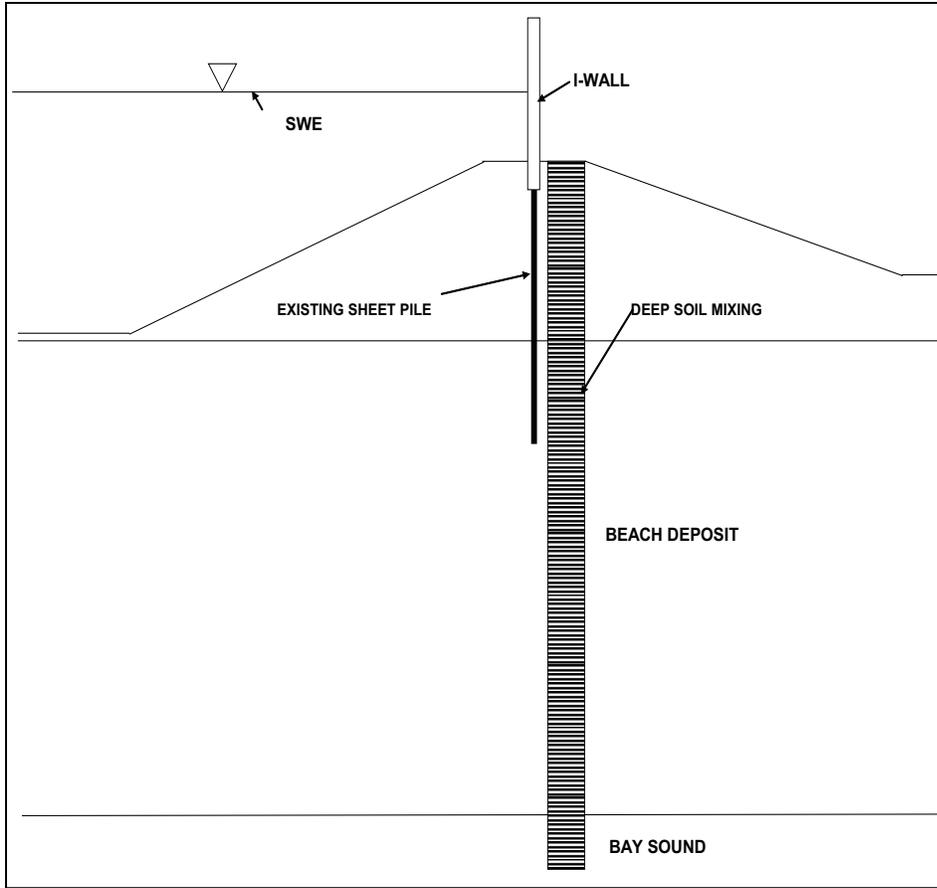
Conceptual drawing of deep-soil mixed panel for cut-off wall or soil strengthening
